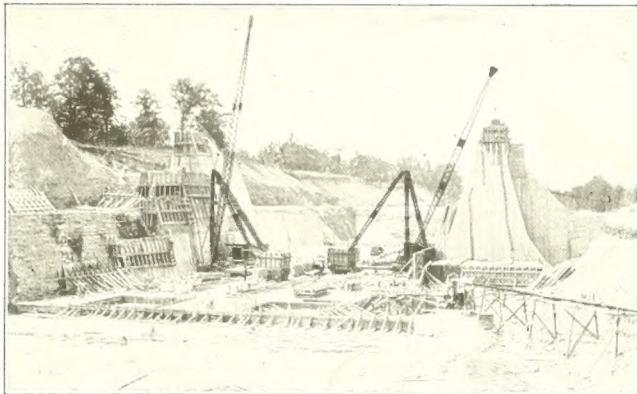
OUTLET STRUCTURE AT TAYLORSVILLE, JULY 7, 1920.
